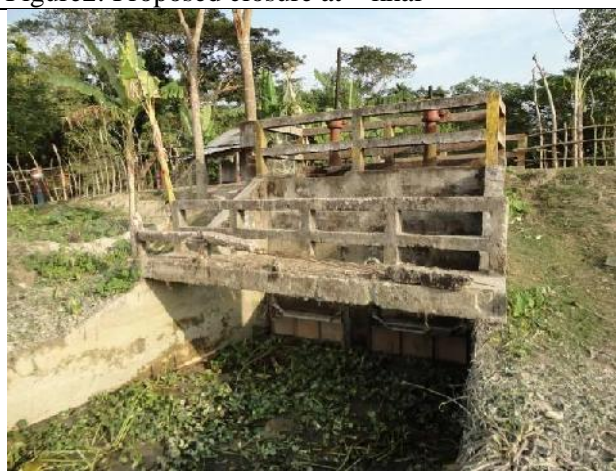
Horinpala 2 vent Drainage Sluice on Padma khal
